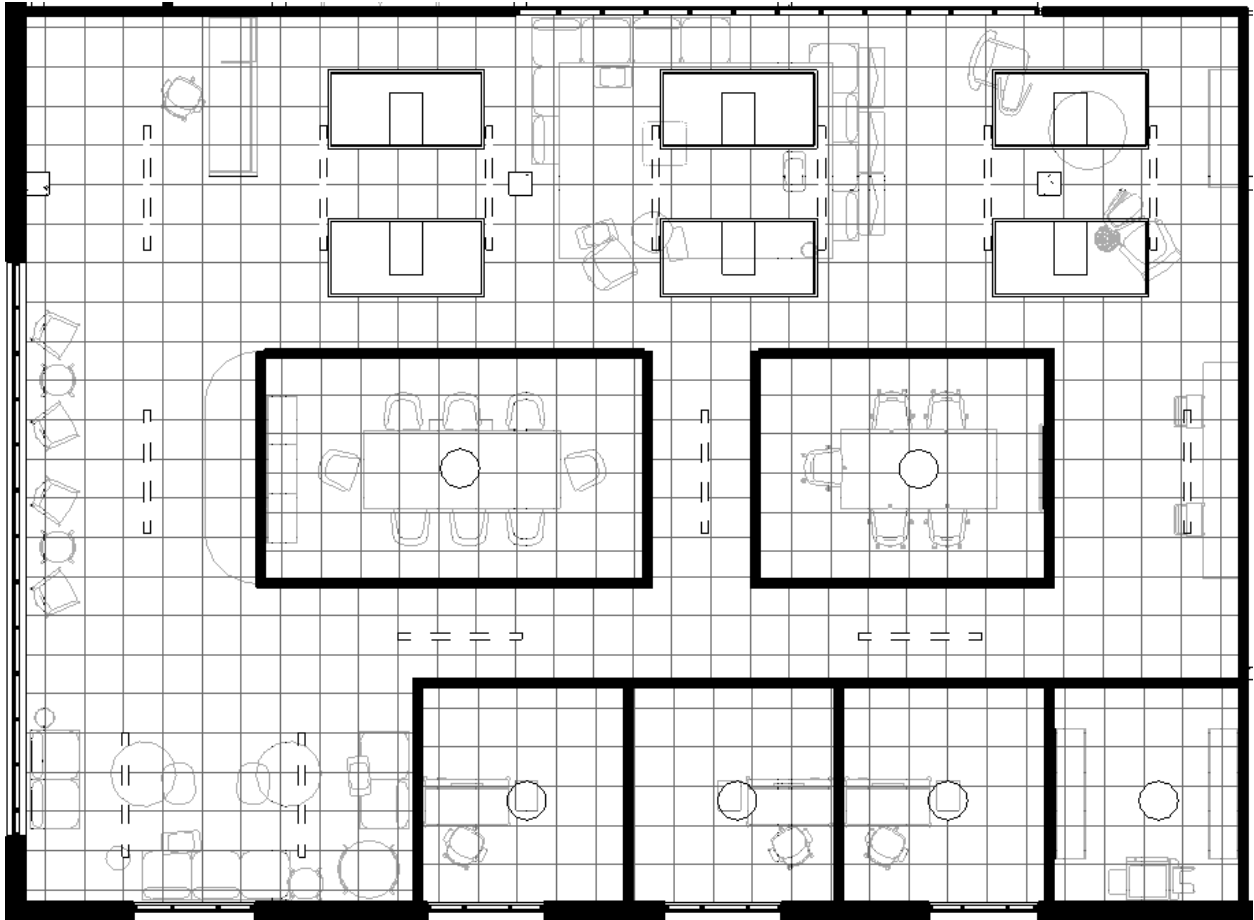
Traditional Skylights Reflected Ceiling Plan Displaying Proposed Skylight Placement (Wood, 2023)
